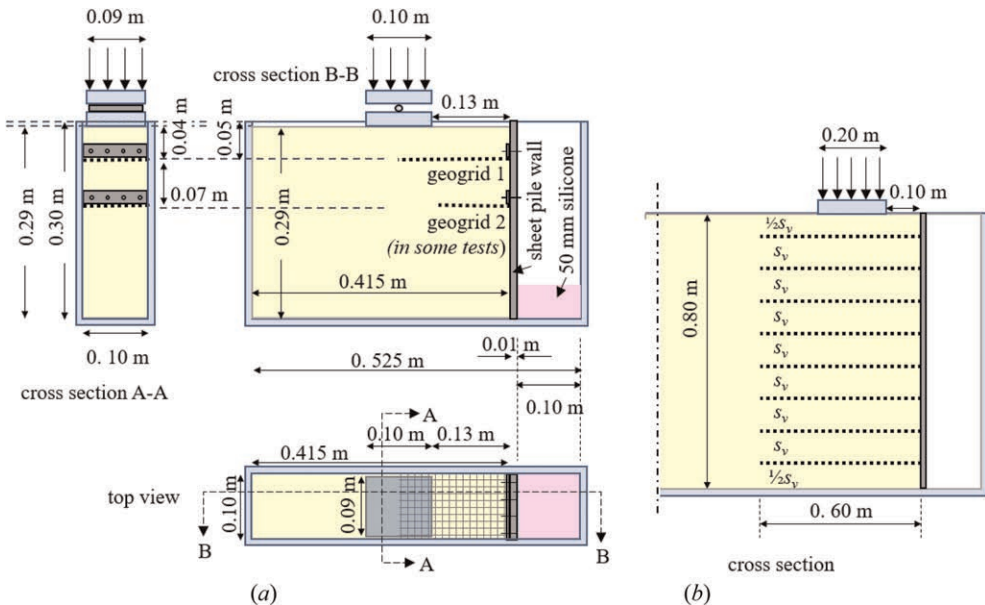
Test set-up for the small-scale tests considered in this paper: (a) geogrid-anchored sheet pile wall (SPW), (b) geosynthetic-reinforced soil wall (GRSW).
